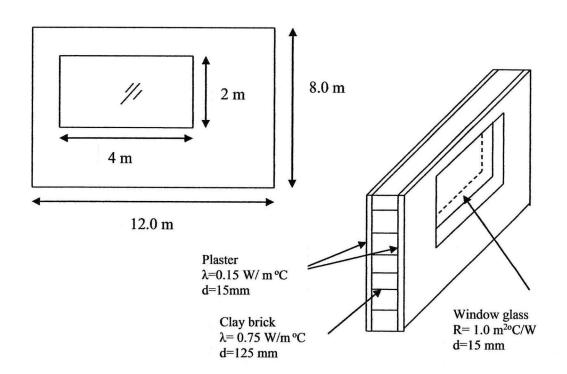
Wall for an Office Building in Parit Raja, Batu Pahat
